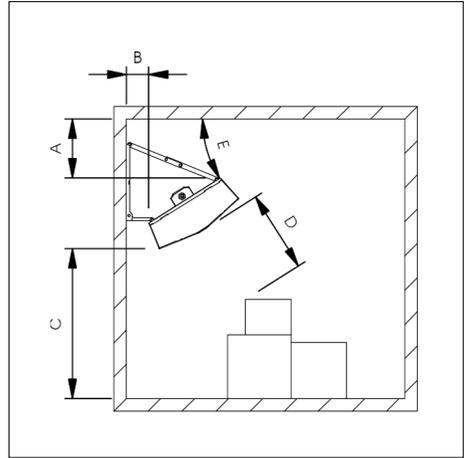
I: Schematic view of the minimum distances of a heater with wall bracket.
